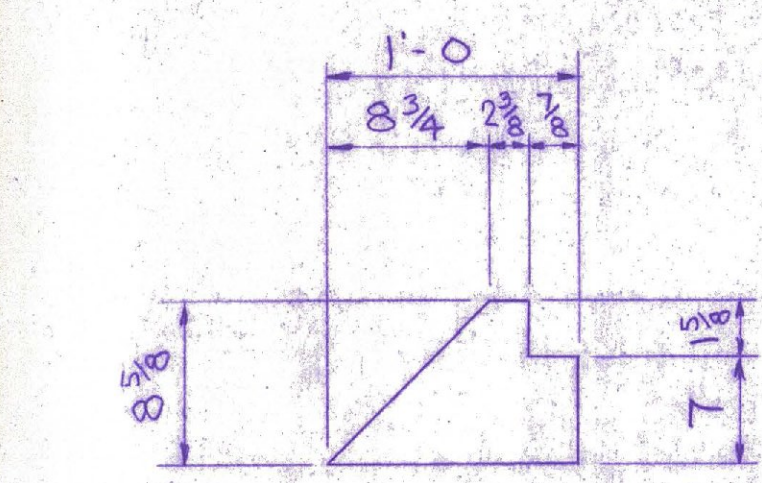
DETAIL OF R (n)<sup>2</sup> (As Shown)
